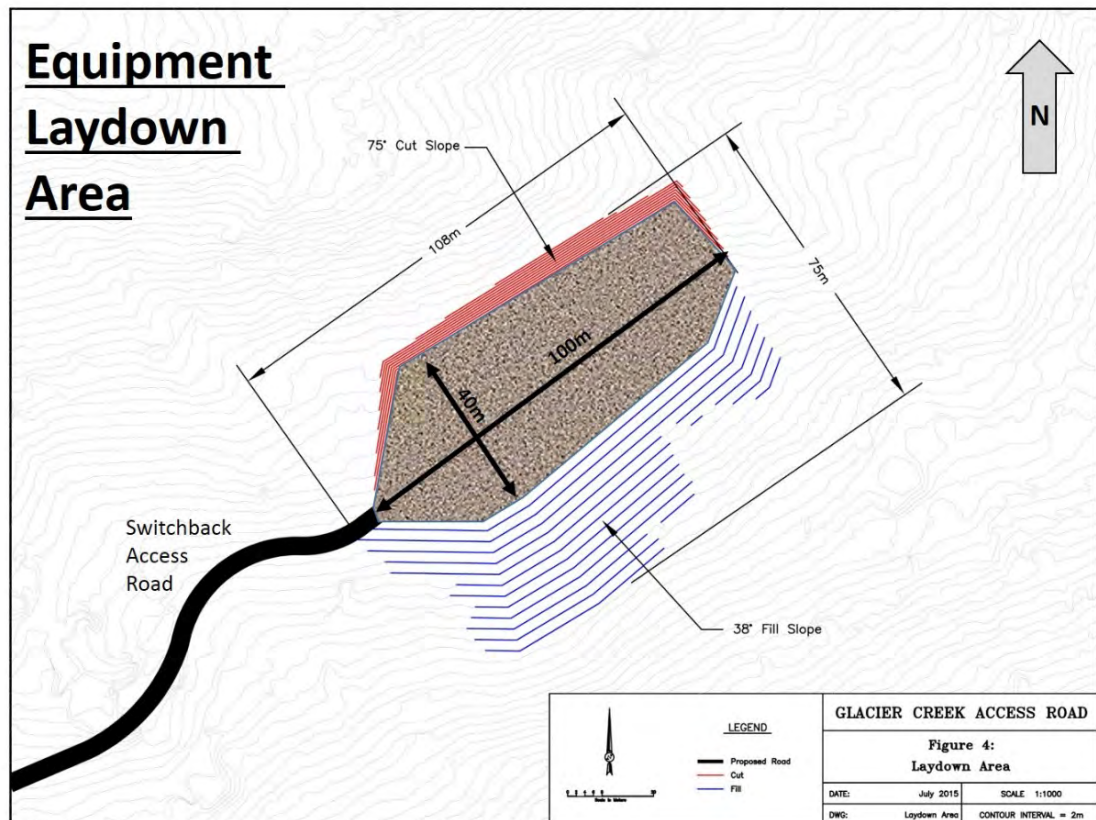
Equipment Laydown Area at the end of the proposed Switchback Exploration Road
